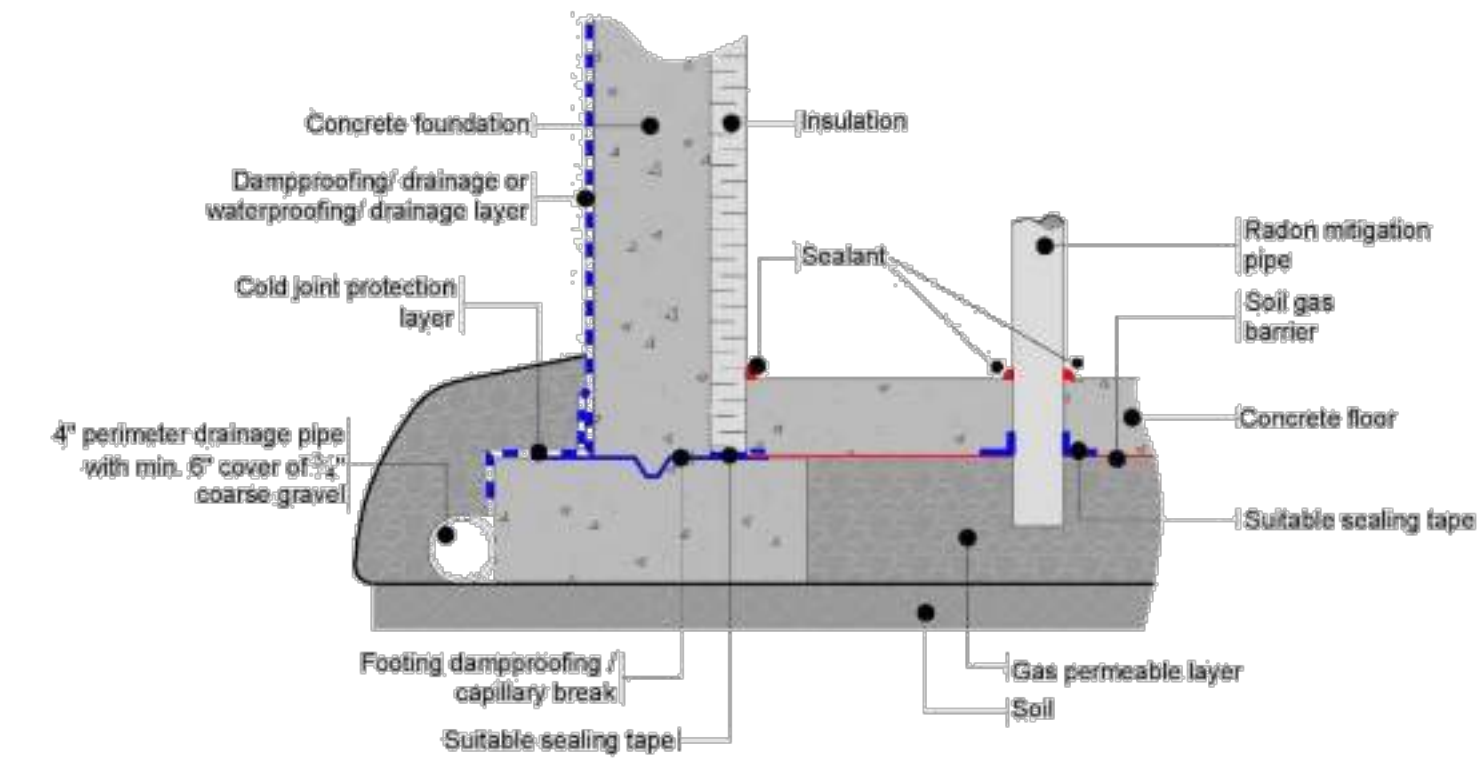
Sealing sub-slab membrane horizontally to concrete footing when insulation is between the foundation wall and floor slab
